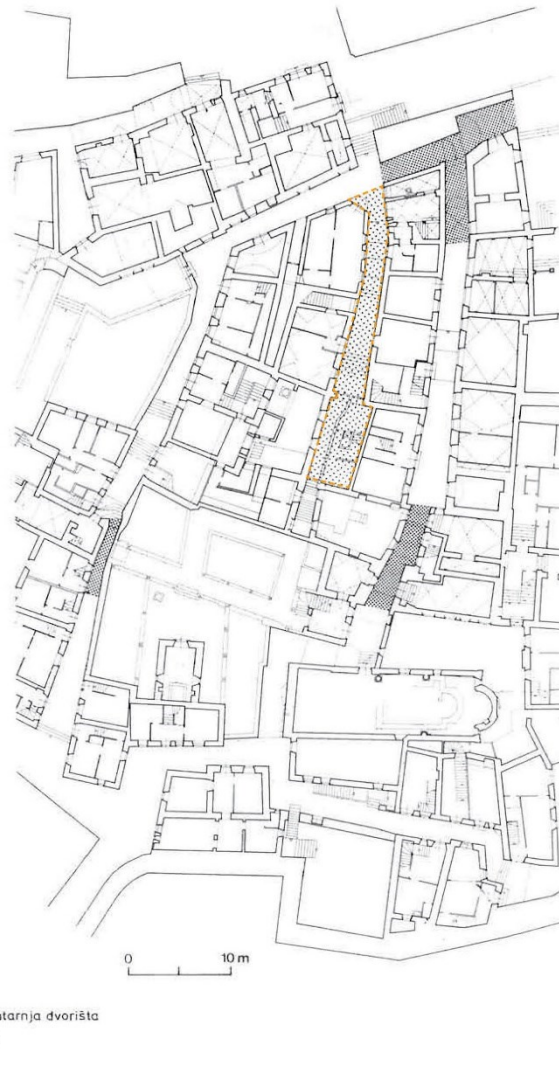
Ground floor plan of the block between Stuli Street and Kneza Krvaša Street in Dubrovnik. Plans reconstructed by Ivan Tenšek.
